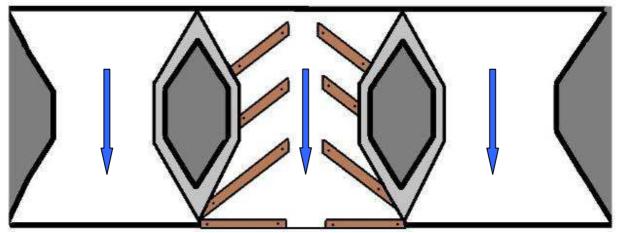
Juxtaposed, upstream baffles would increase water depth and provide resting areas to assist fish in passing the bridge footings.
